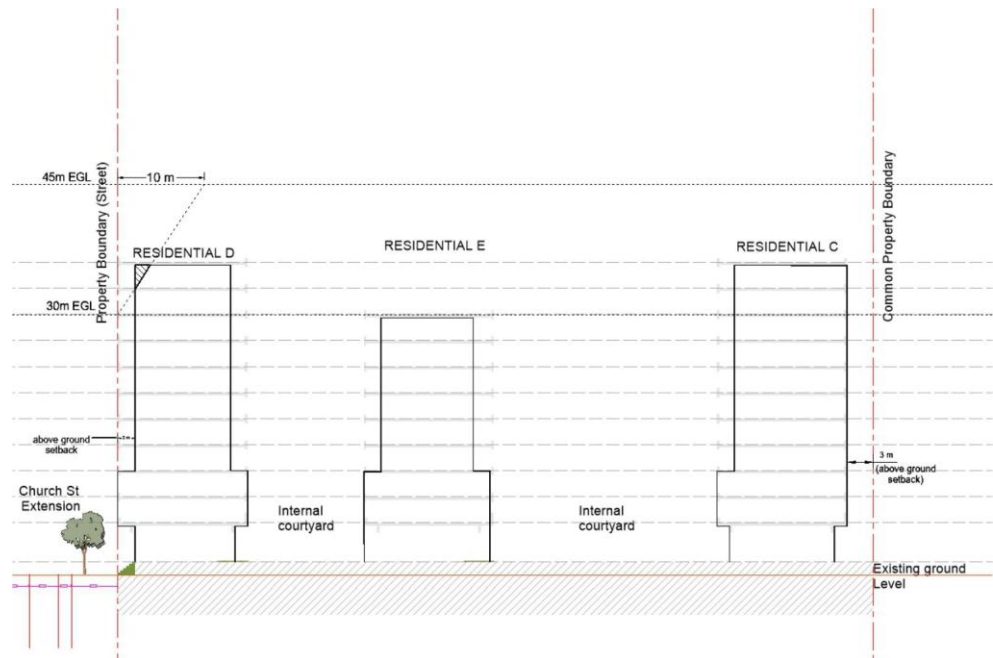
Portion 2 Building line departures on Church Street Extension
